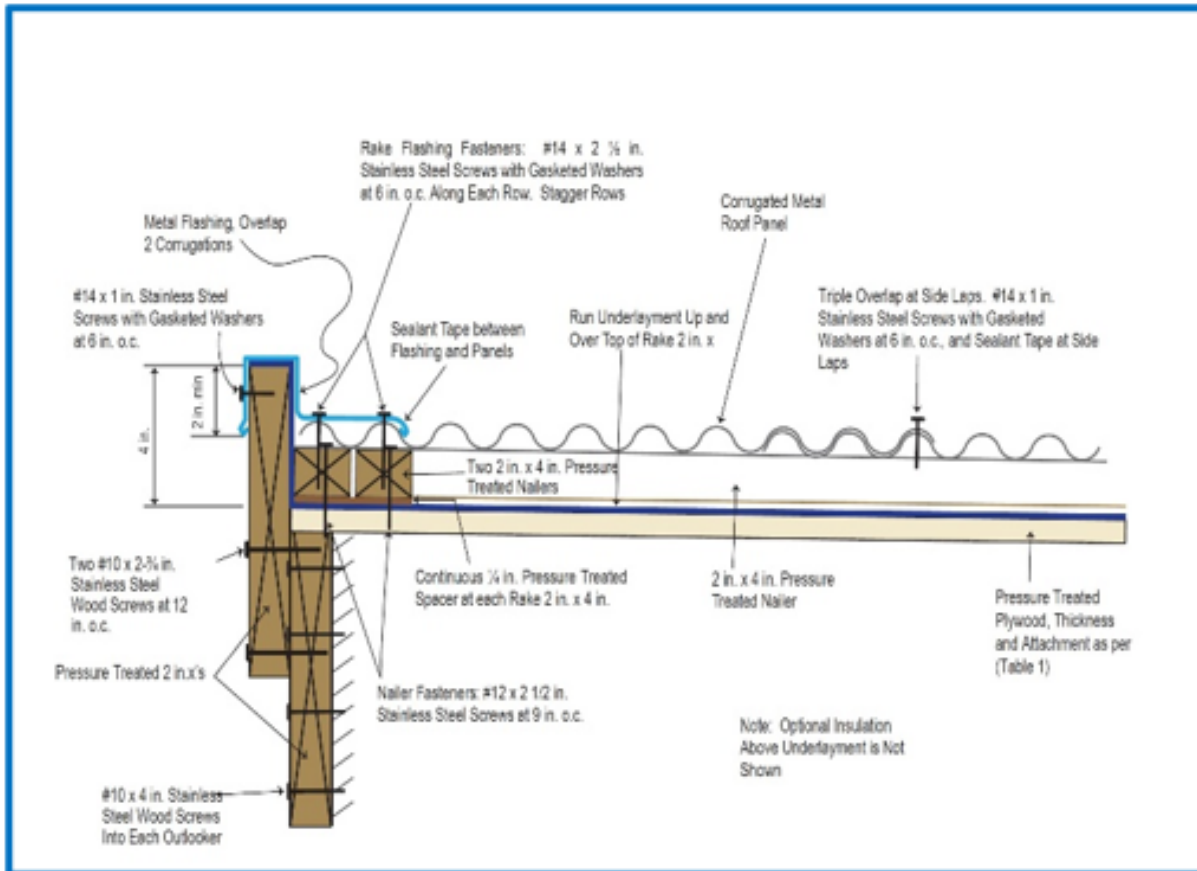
Recommendations to build a stronger roof from FEMA include: (i) between the trusses and the metal corrugated roof is plywood sheathing – minimum 5/8 inch thick, (ii) self-adhering bitumen layer underlayment (ASTM D 1970) or bitumen tape along plywood joints to prevent leaks, (iii) purlins or nailers that are 2 feet 3.5 inches apart, (iv) overlap of the metal corrugated roof with three ridges vs. two as in Figure 4-29, (v) trusses that are 2 feet apart and (vi) tighter spacing of the nailers or purlins at the edges and or ridges of the house to account for increased wind pressure there – see Figure 4-31.
